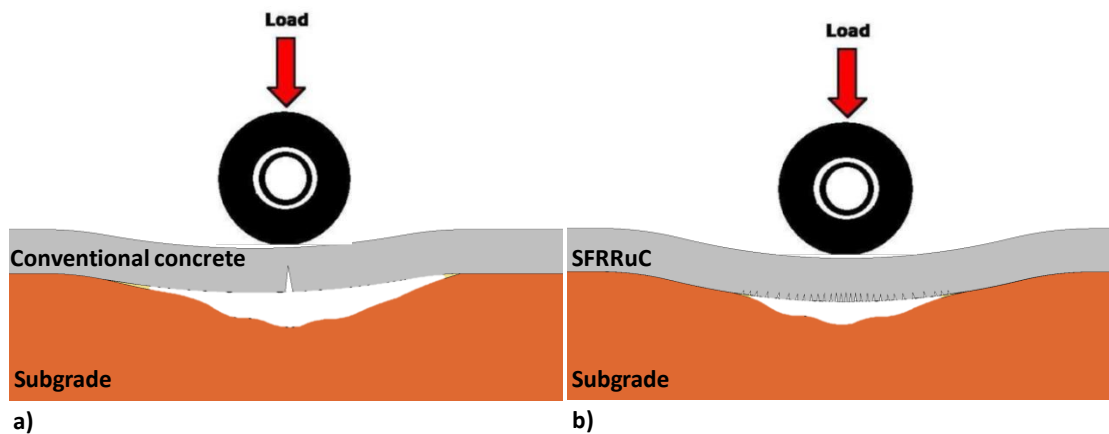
Ability of different pavement solutions to accommodate settlements a) conventional rigid concrete pavement and (b) flexible SFRRuC pavement
